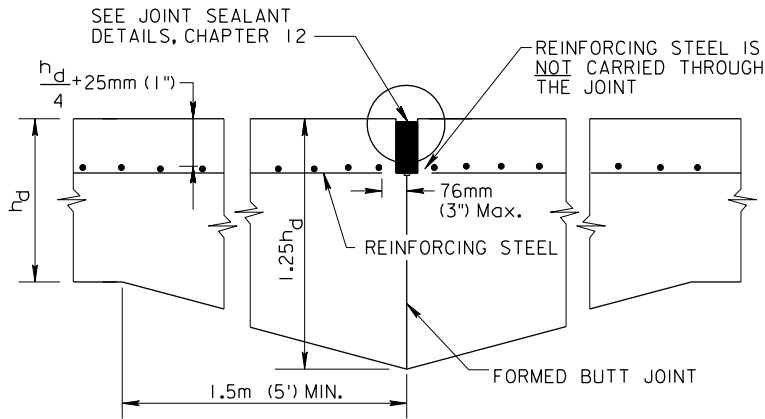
Construction Joints for Reinforced Pavements
